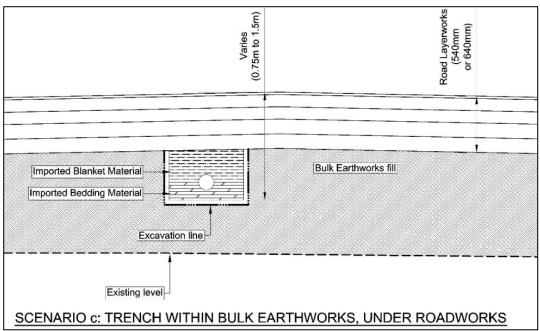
SCENARIO C: SERVICES- TRENCH WITHIN BULK EARTHWORKS (UNDER ROADWORKS) (SOURCE: WALTERS, 2020)
